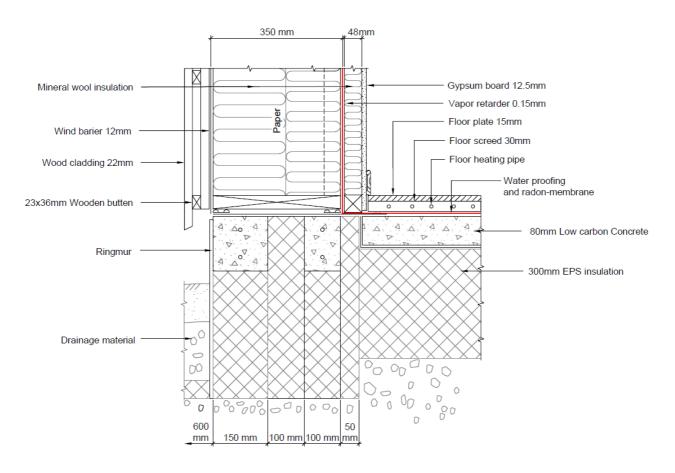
concrete floor with exterior timber wall detail (Byggforsk TEK17)
